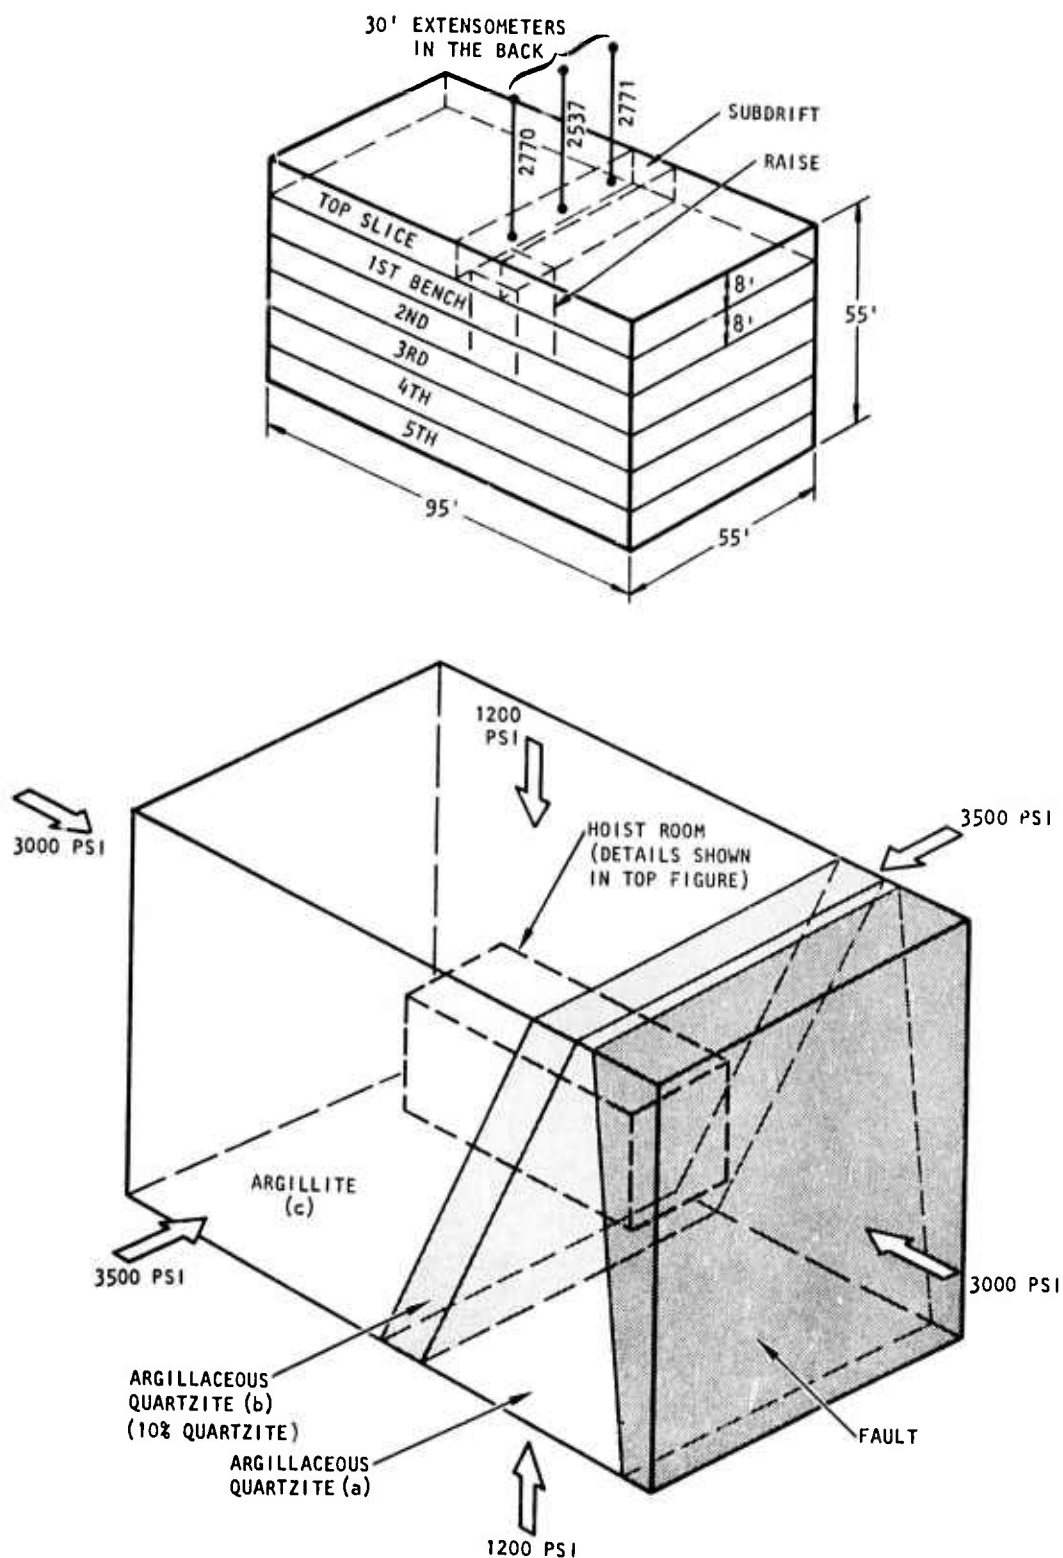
IDEALIZATION OF HOIST ROOM DIMENSIONS, EXCAVATION SEQUENCE AND IN SITU STRESSES
